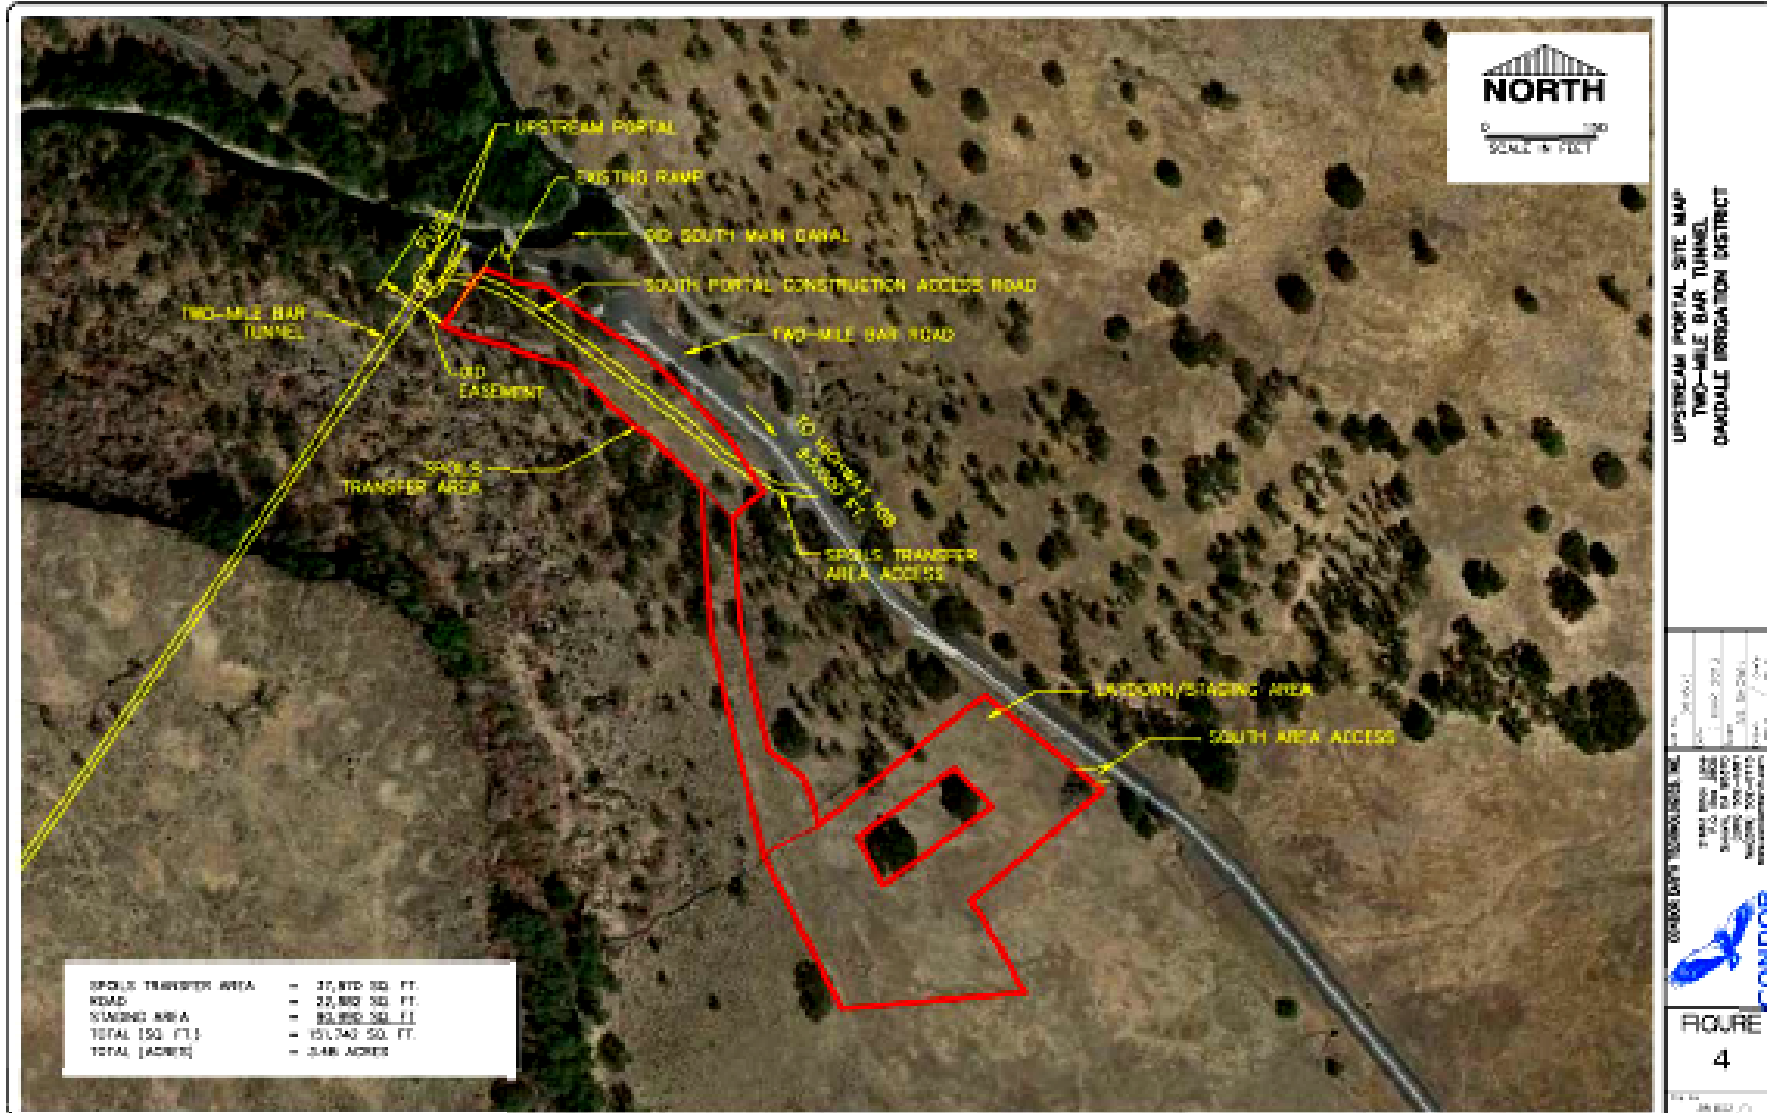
Aerial View of Location and Details of Alignment of Upstream Portal and Tunnel Connection to South Main Canal, Staging Area, Spoils Transfer Area, and Construction Access.
